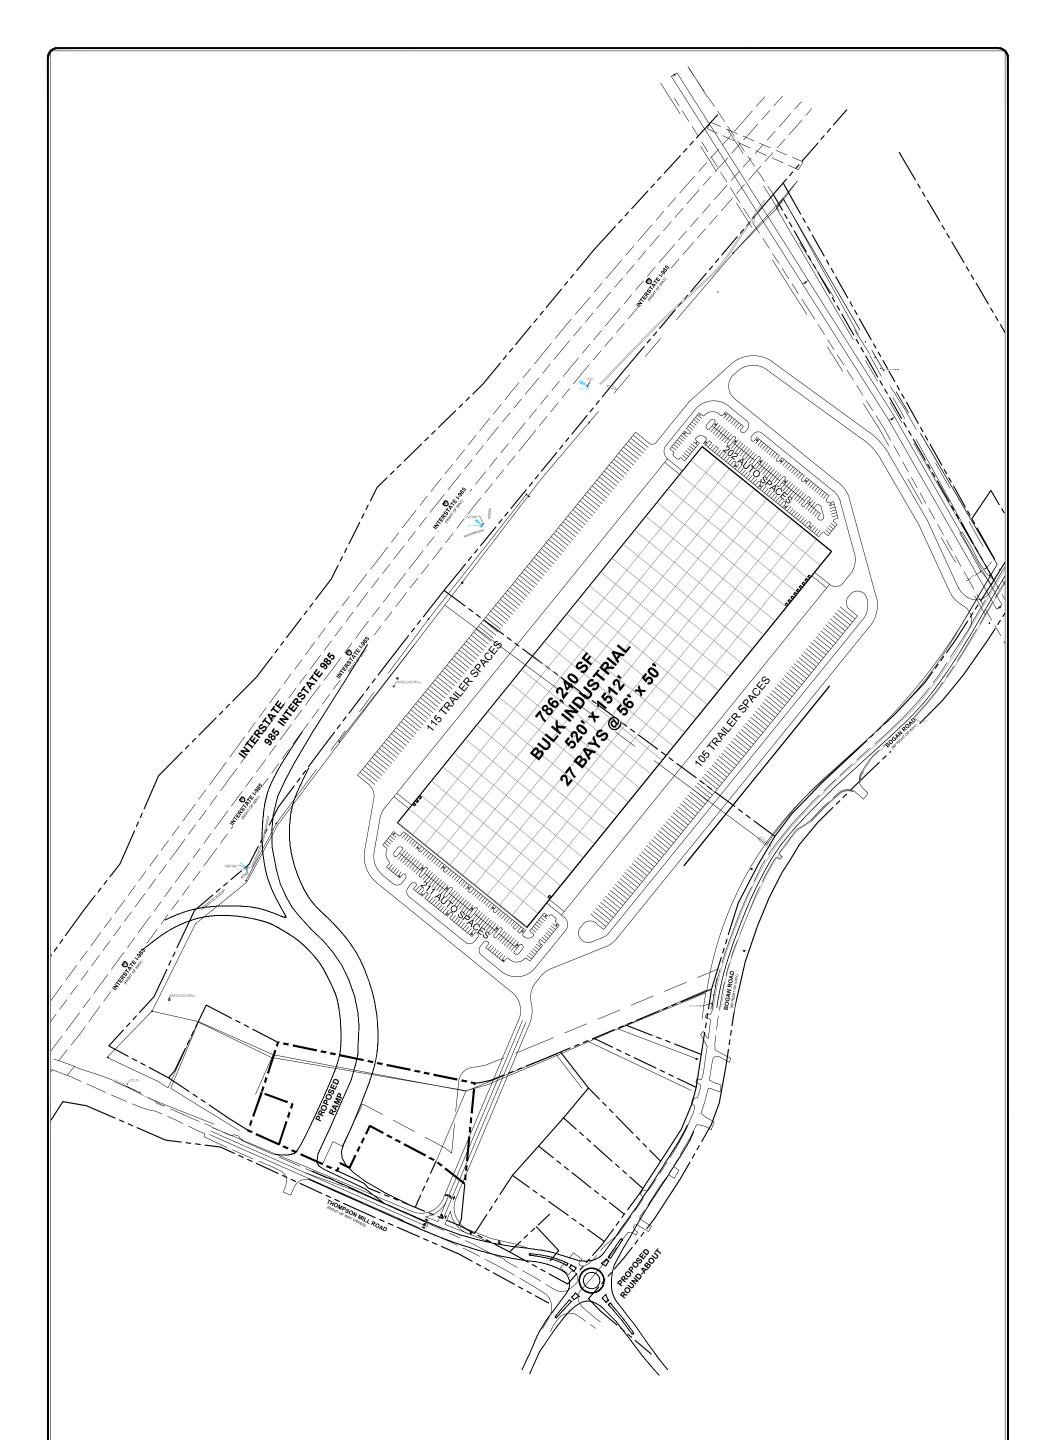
EXHIBIT A BOGAN ROAD CONCEPT PLAN
